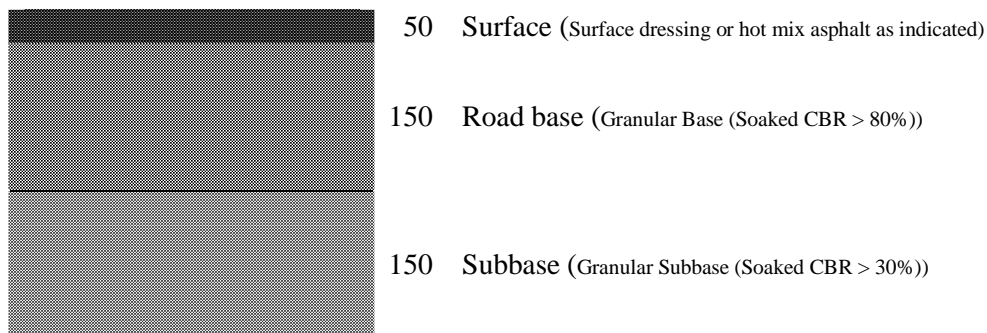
Standard Pavement Configuration of South Rukuru Bridge
